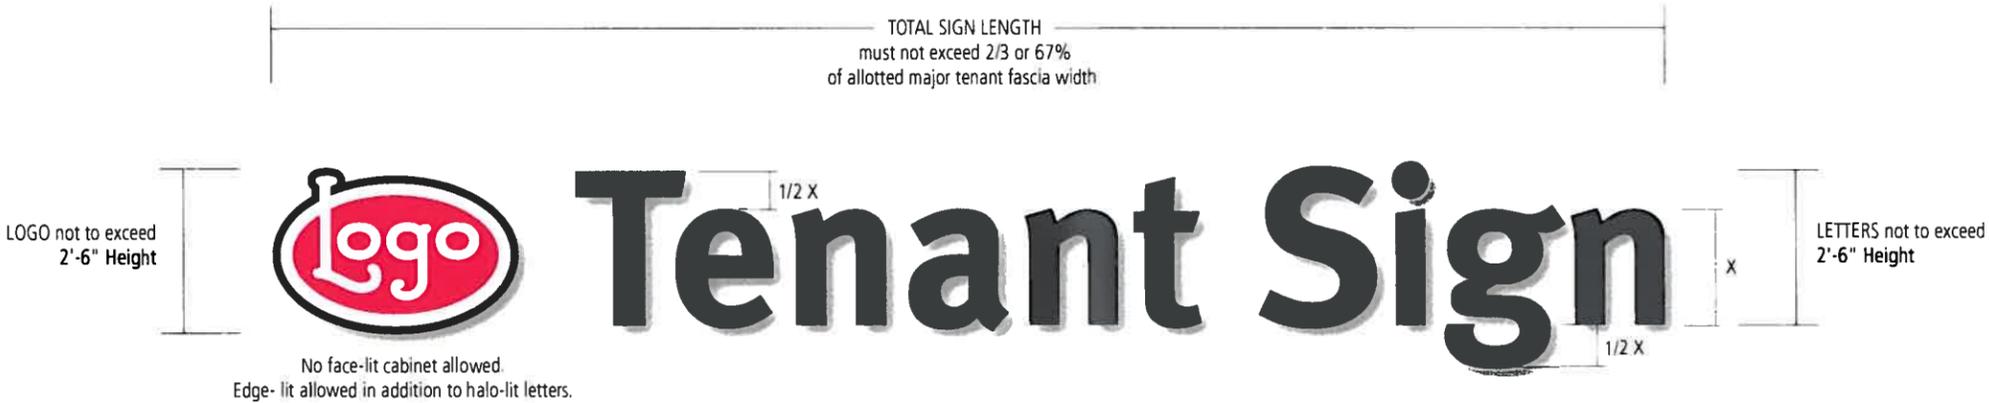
Exhibit A | Typical Retail Tenant Building Sign- Single Copy Line Layout
